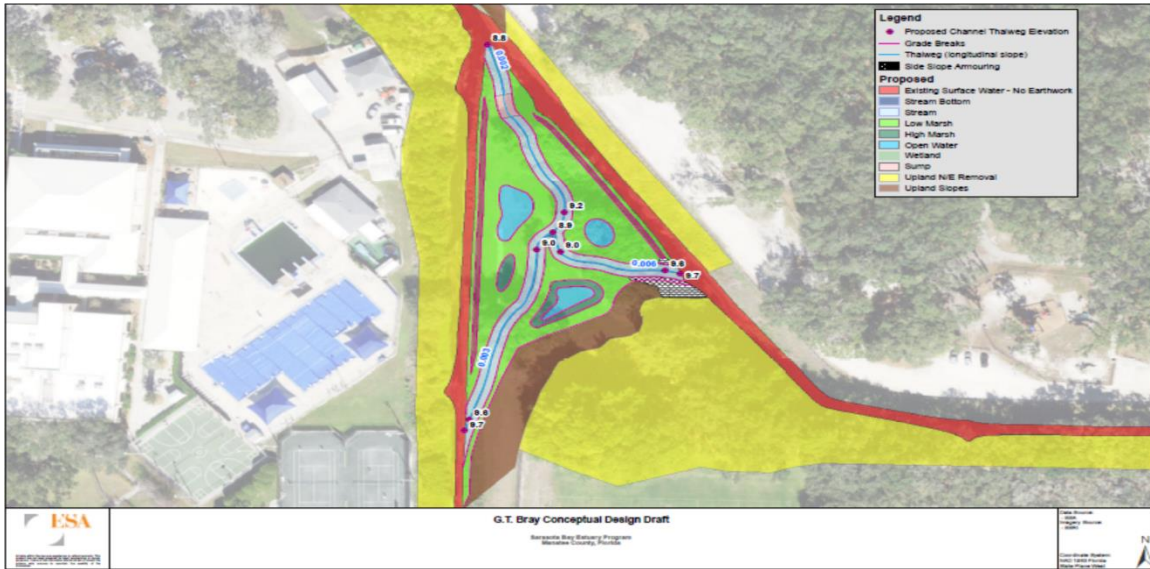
Aerial view of the stormwater pond to be retrofitted and revitalized at GT Bray Park
